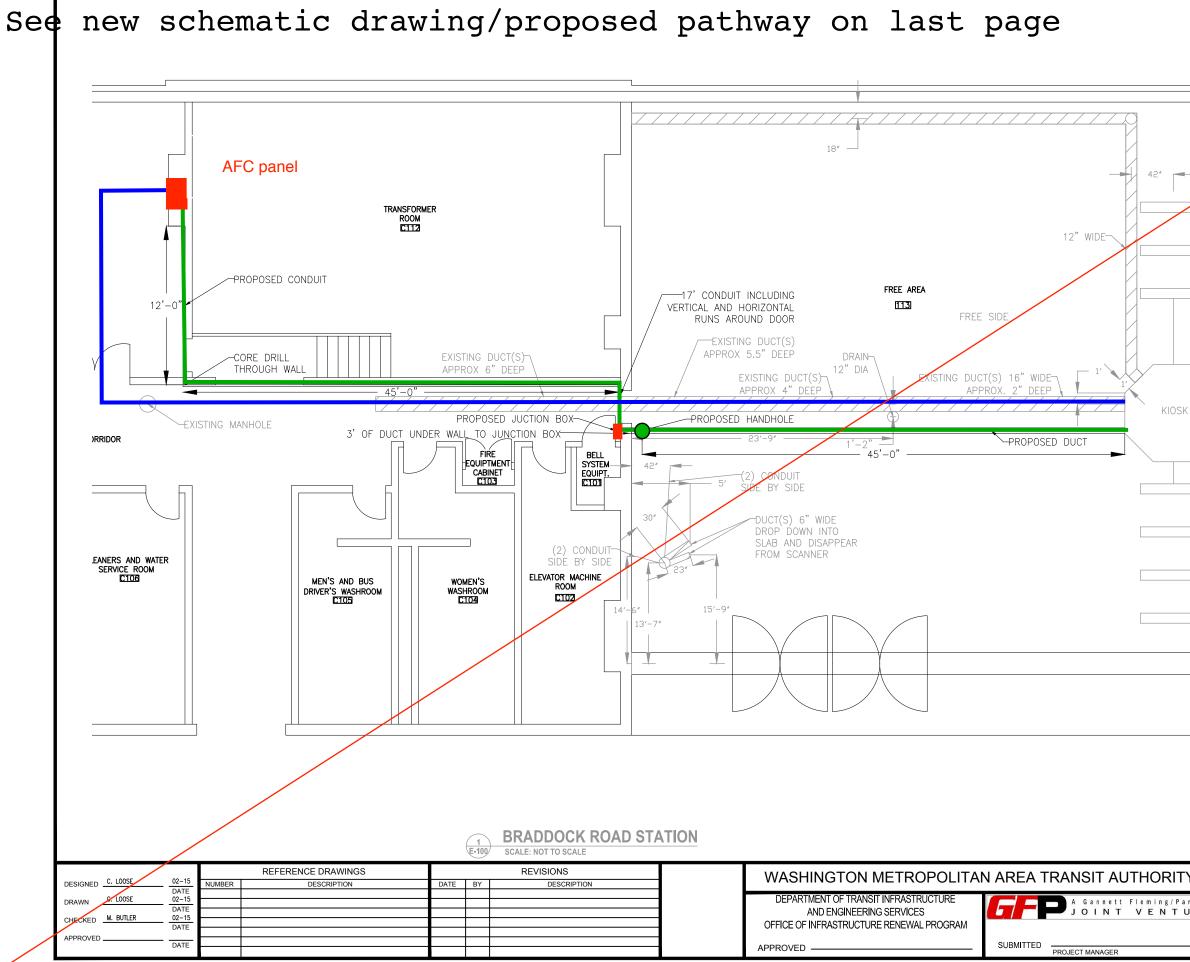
C12 Braddock Road: Existing duct to AFC panel in Room #C111.
